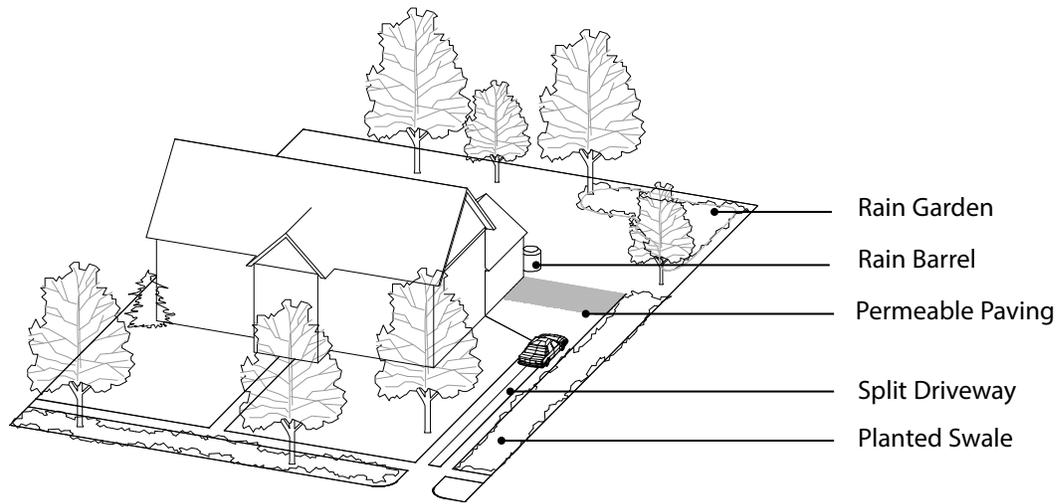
E-3. Residential Site Example incorporating Infiltration and Retention Methods.
